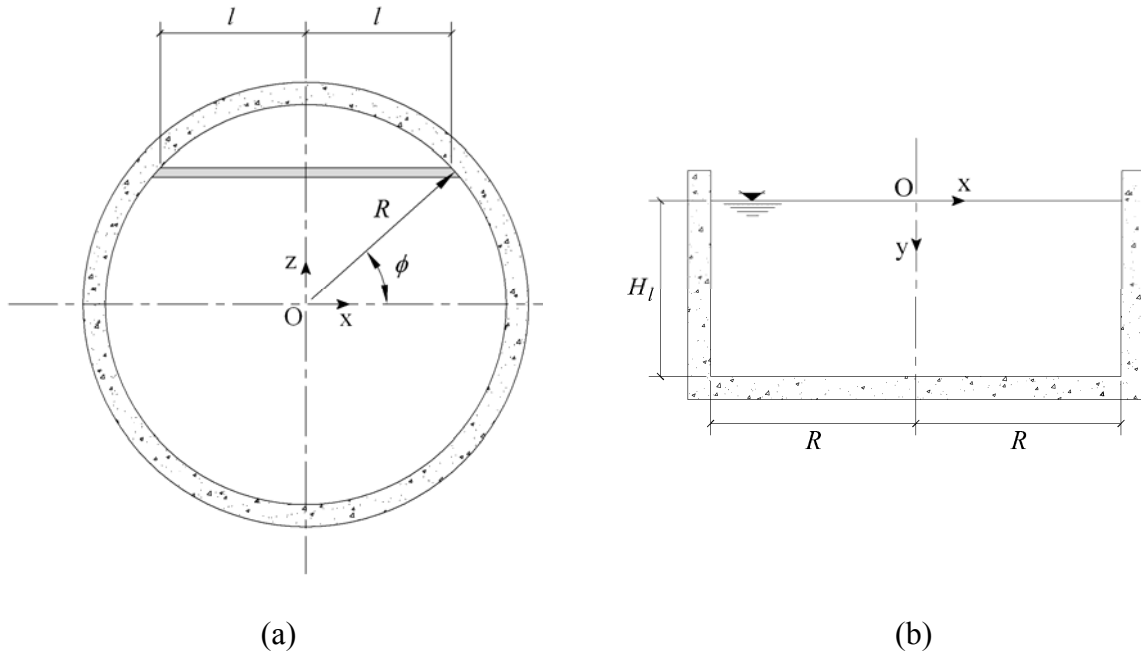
Typical cylindrical tank; (a) tank plan, (b) tank section
